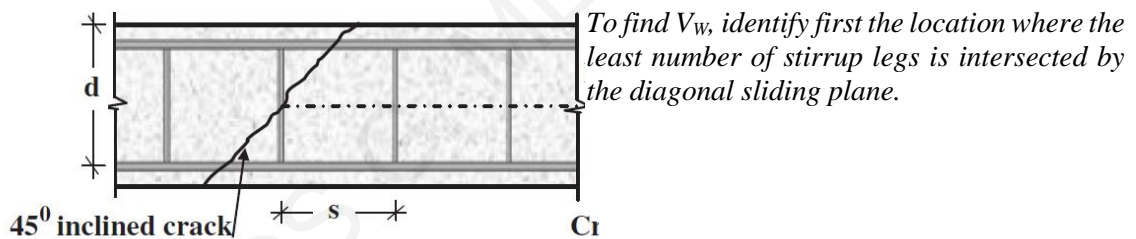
The number of stirrups intersecting the sliding plane could be zero (Syntzirma and Pantazopoulou 2010))
